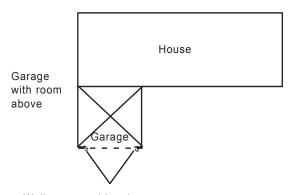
If the wall of the main house is in line with the wall containing the door of a garage with a room over it, the adjoining wall may help brace the garage.
